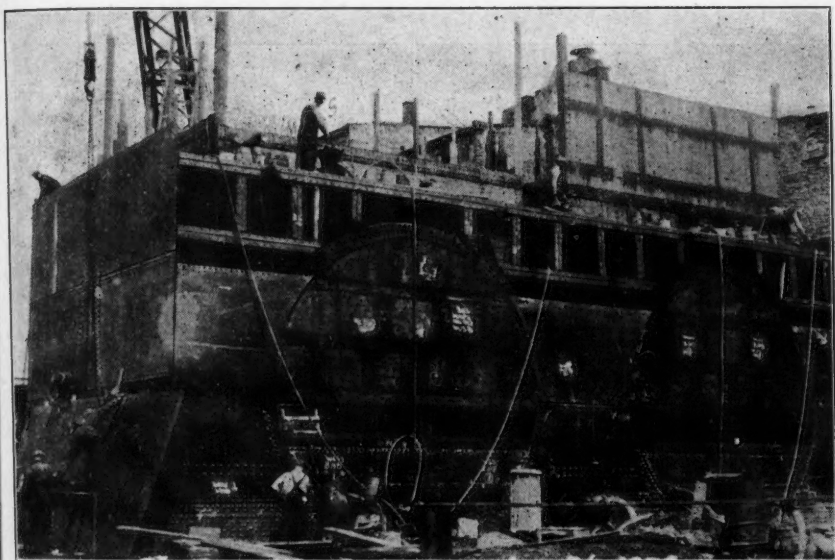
STEEL ERECTION AT LATER STAGE.
